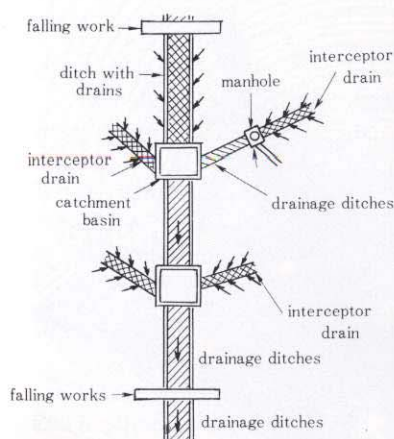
(1) Arrangement of ditches and interceptor drains
